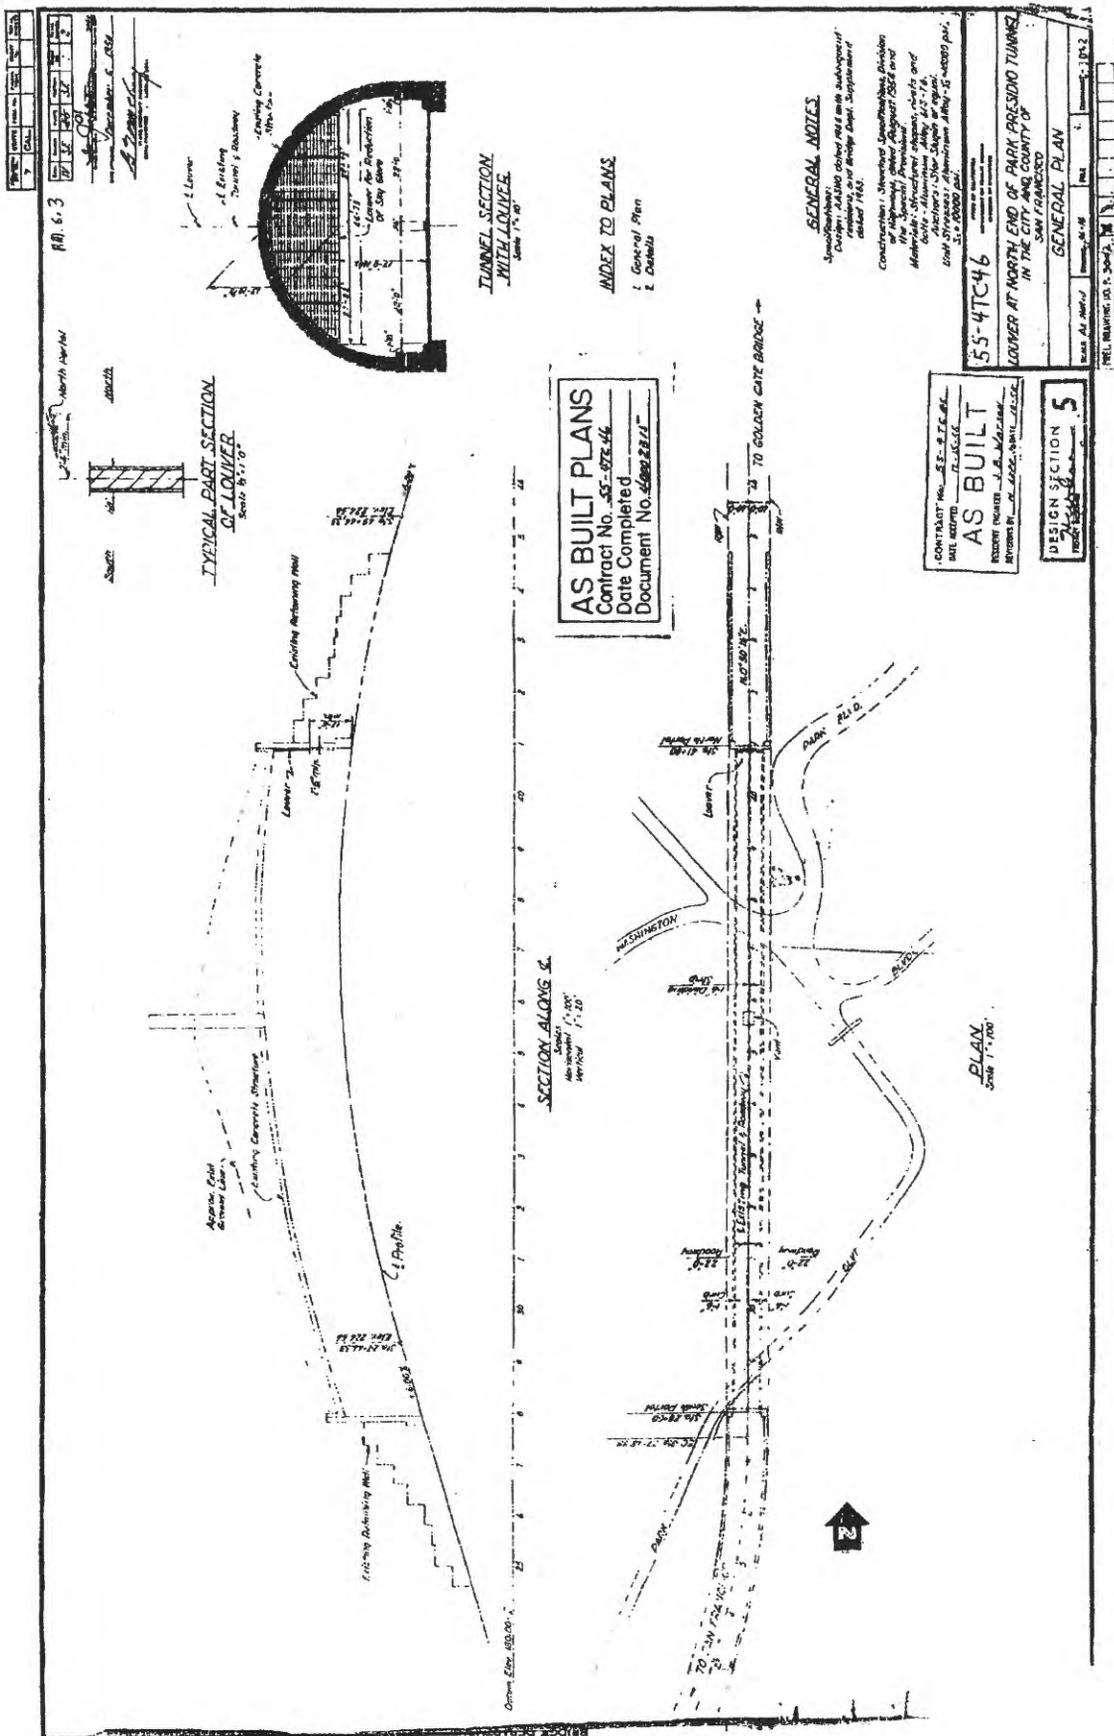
General Plan drawing of Presidio Park Tunnel.
